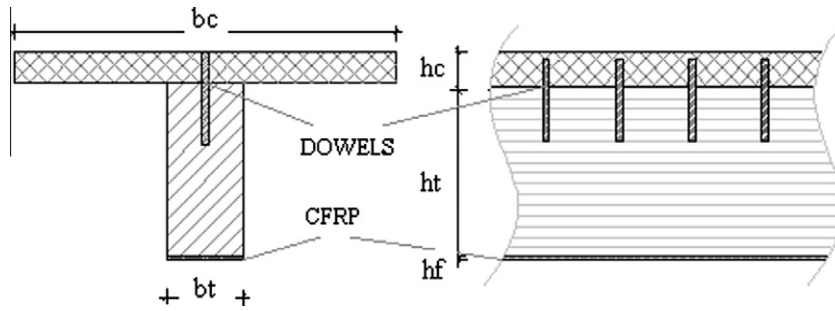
Reinforcement by gluing CFRP strips on the tensile edge of the beam.
